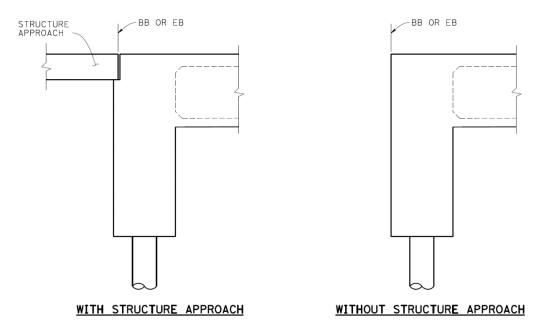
Diaphragm Abutment BB and EB Locations
